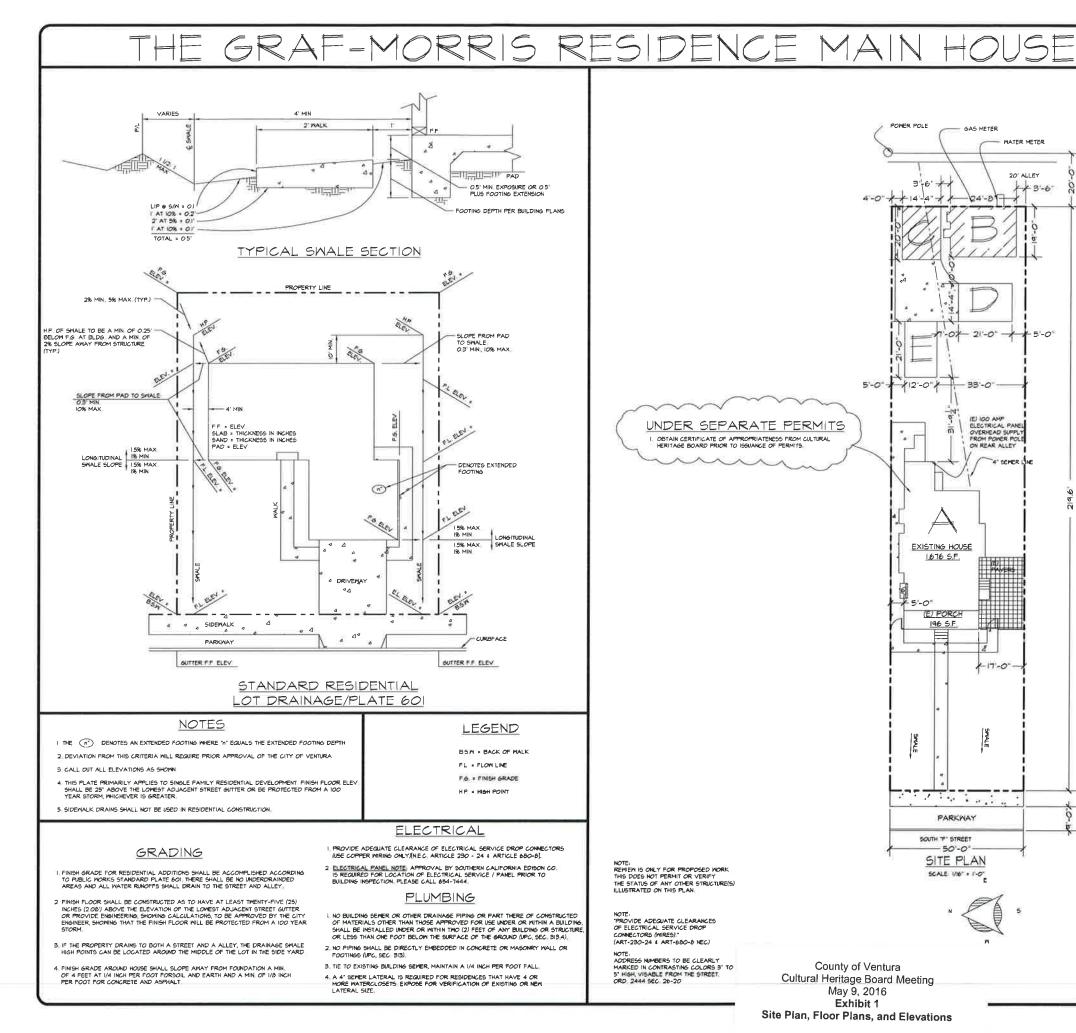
Site Plan, Floor Plans, and Elevations Exhibit 2: Certificate of Appropriateness application
